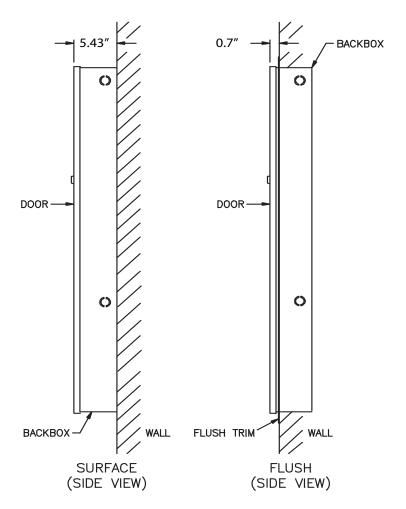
Surface and Flush Mounting Views of the BBX-1024XT
